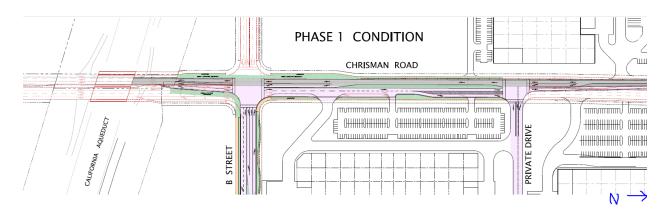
Kier + Wright Improvement Drawings for Initial Phase Access from Chrisman Road (north is facing to the right)
